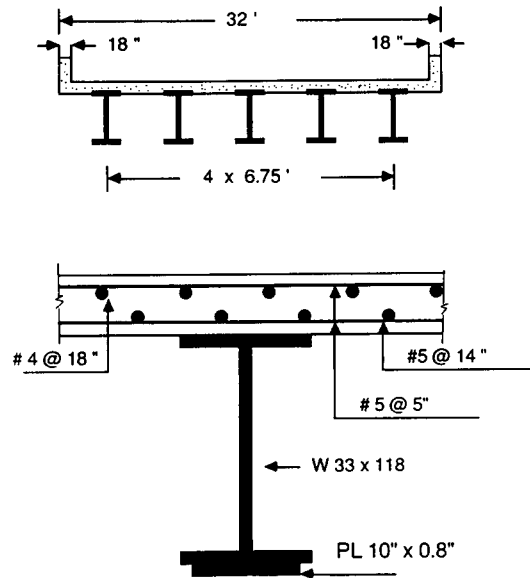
Composite steel girder bridge considered in the analysis. Units: 1 in. = 25 mm; 1 ft = 305 mm.
